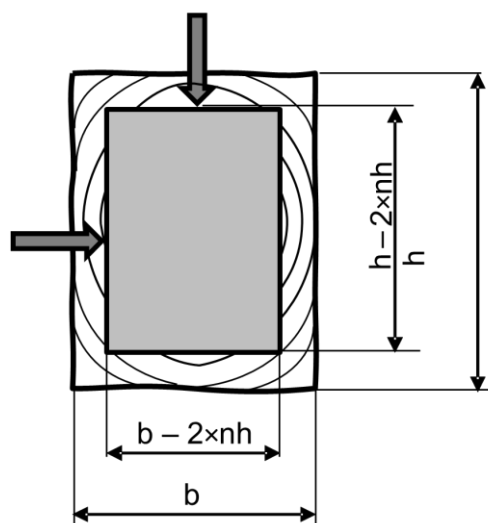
Determination of remaining effective cross-section by the Nail-hammer test (nh – Nail-hammer penetration depth)
